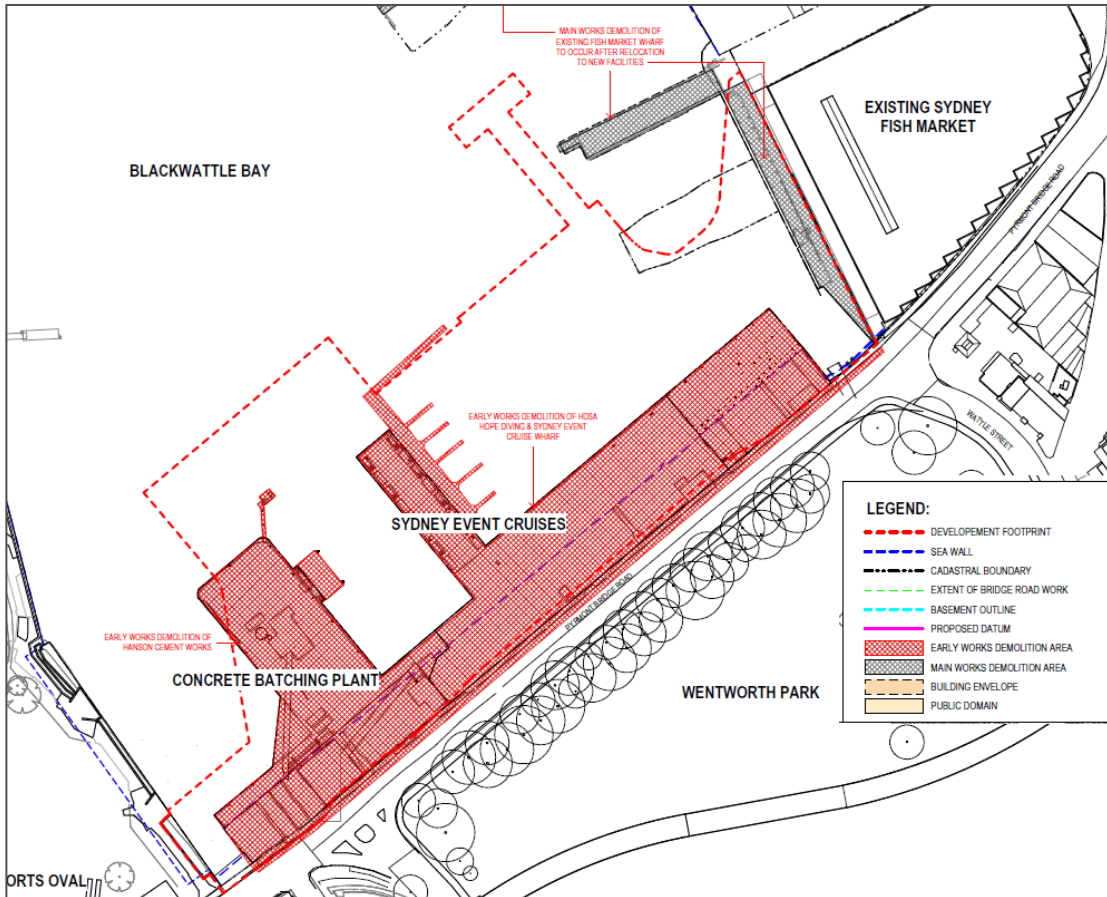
| Extract of the Demolition Plan (Source: EIS)
